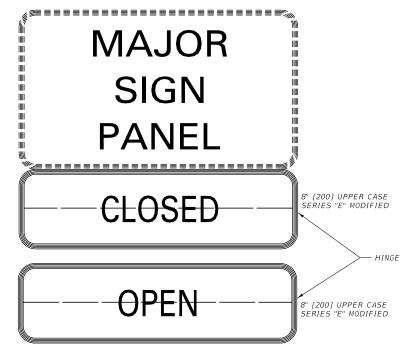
DETAILED DRAWING REFERENCE STANDARD SPEC. SECTION 619, 704
